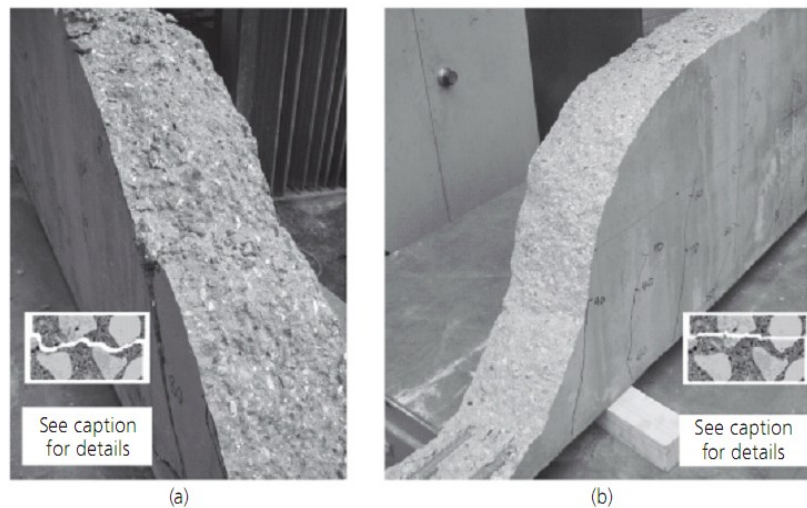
1: Failure surface at critical shear crack in beams without stirrups: (a) rough crack surface in beam with gravel aggregate; and (b) smooth crack surface due to aggregate fracture in beam with limestone aggregate.(Sagasetta and Vollum)
